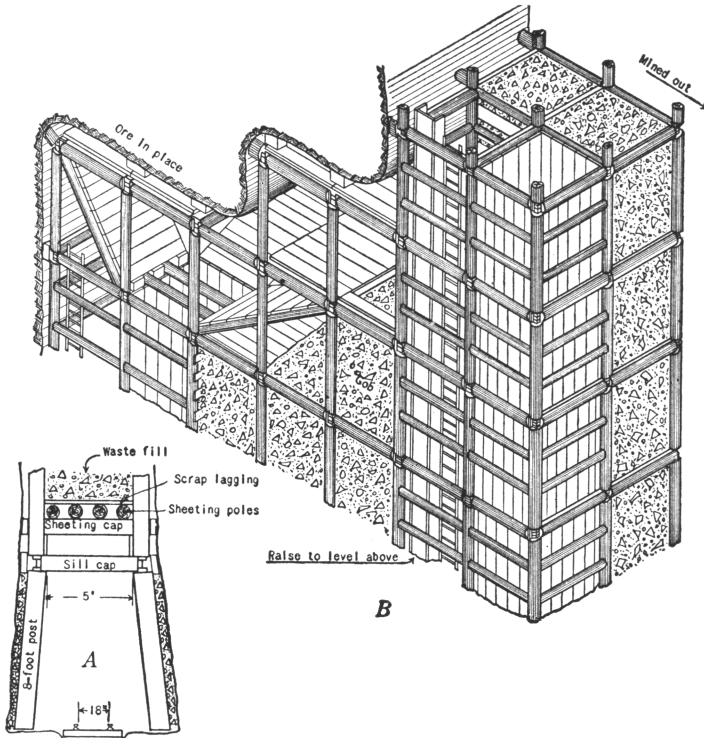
Overhand square-set stoping, Black Rock mine, Butte, Mont.: *A*, Sill set, showing sheeting cap; *B*, general cross-section of overhand stope, footwall view.
